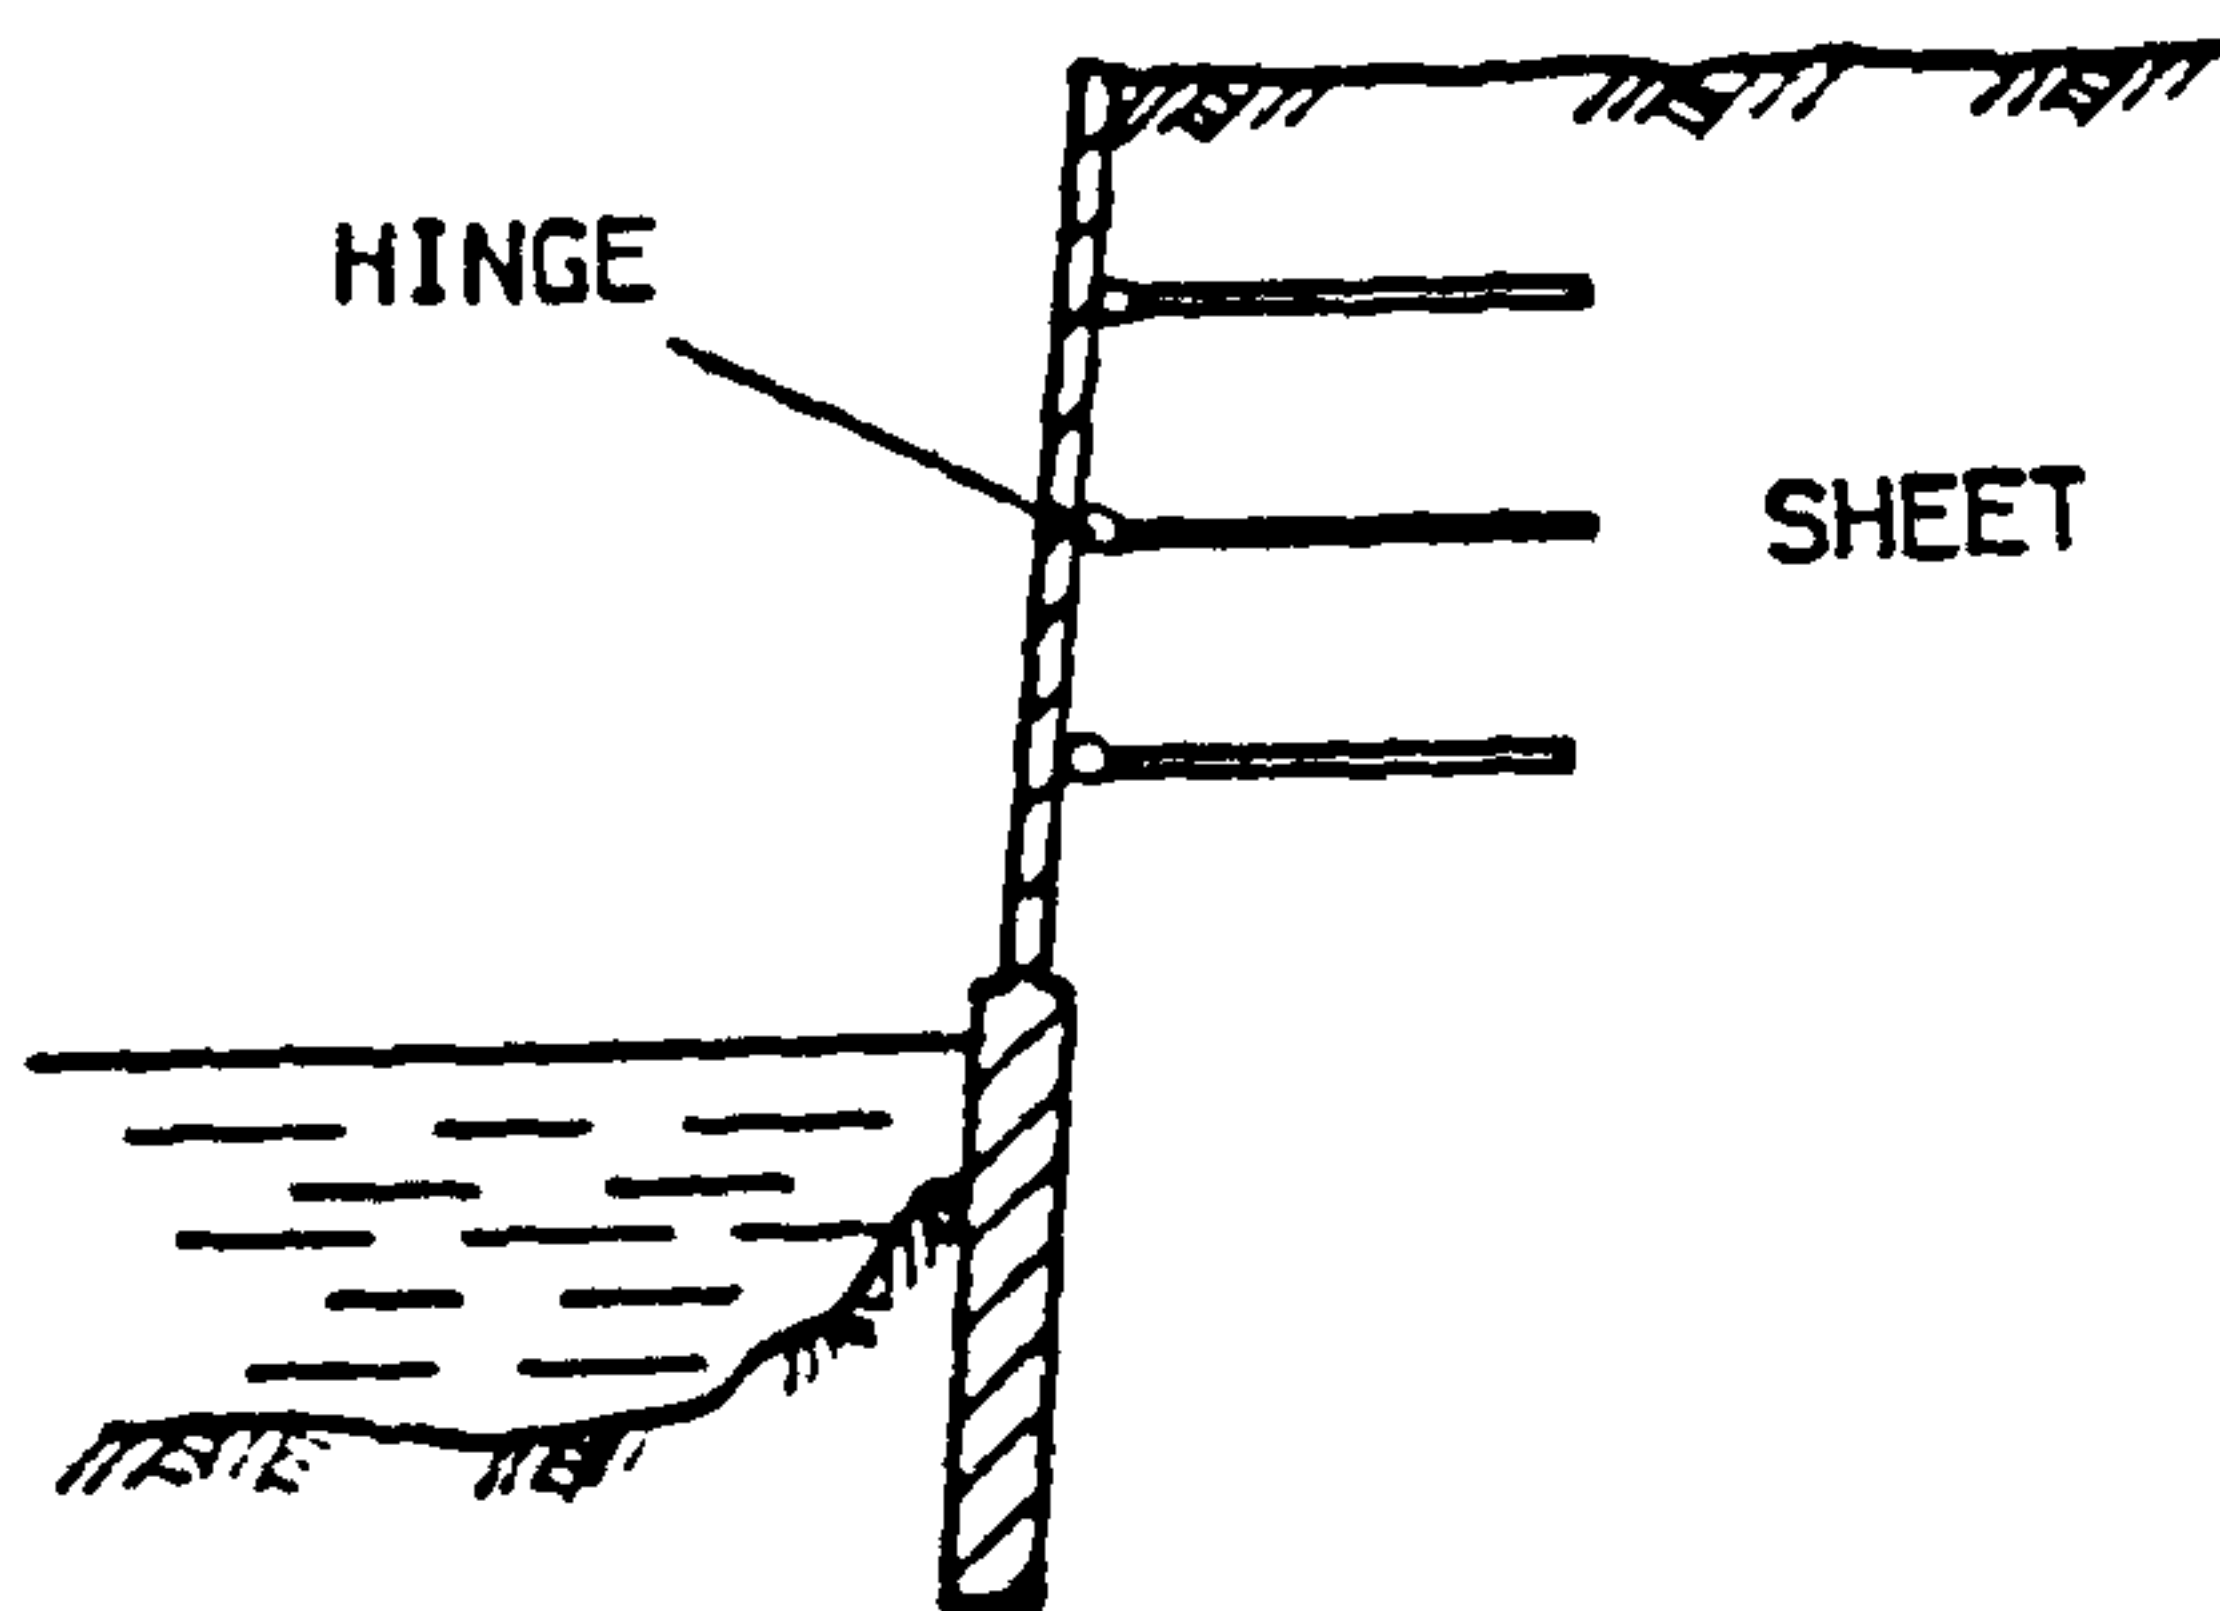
RETAINING WALL WITH SHEETS HINGED AT THE BACK (AFTER SCHROETER, 1933).
